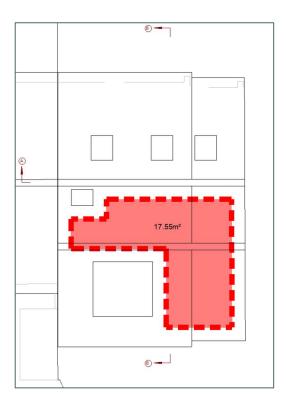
Roof Plan of Proposed Development showing roof space available for PV (Charleton Brown)
